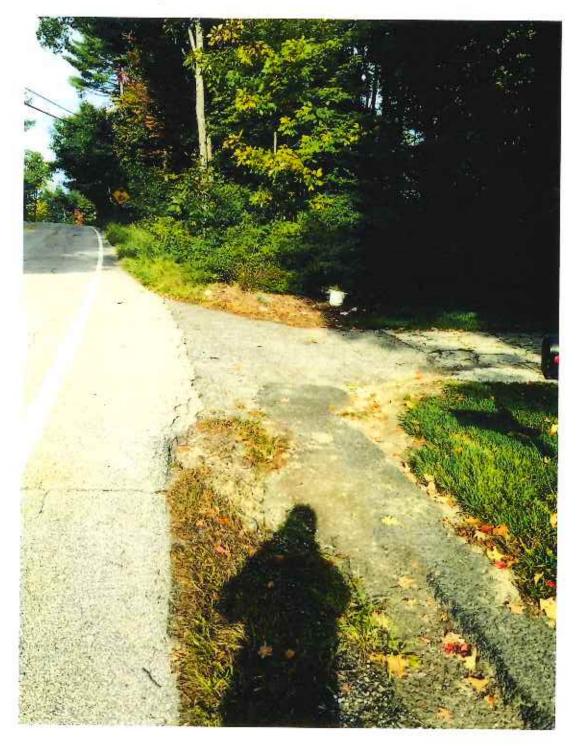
Existing driveway to receive roadside ditch culvert.
